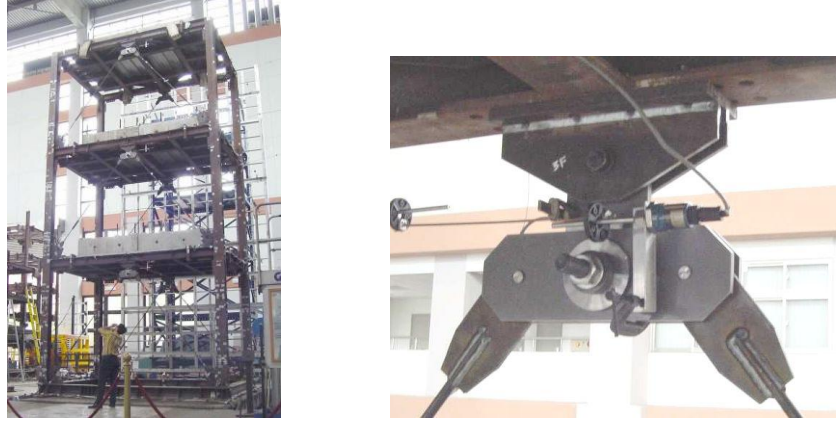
Layout of full-scale testing at NCREE and closer view of one of the RFDs
